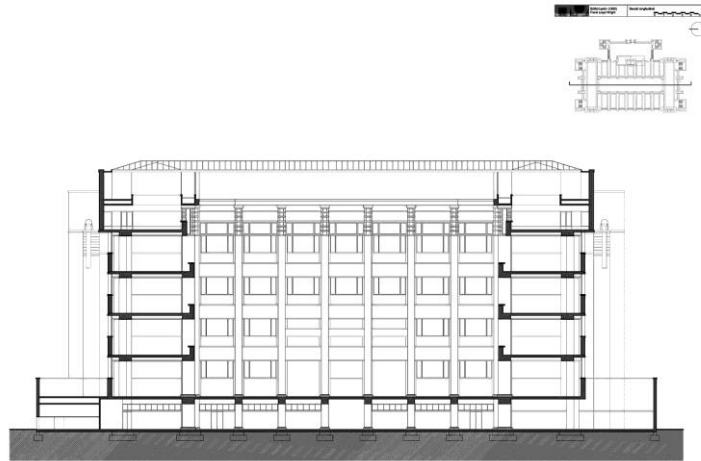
Frank Lloyd Wright Larkin building section (URL1)
